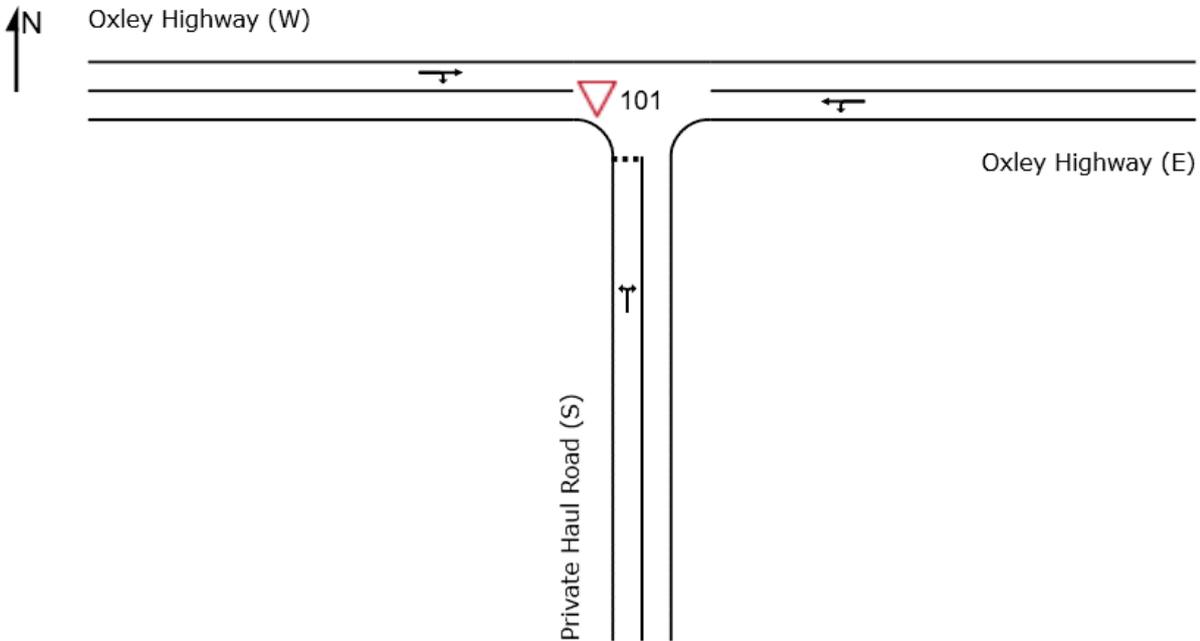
Oxley Highway/Private Haul Road Intersection layout
